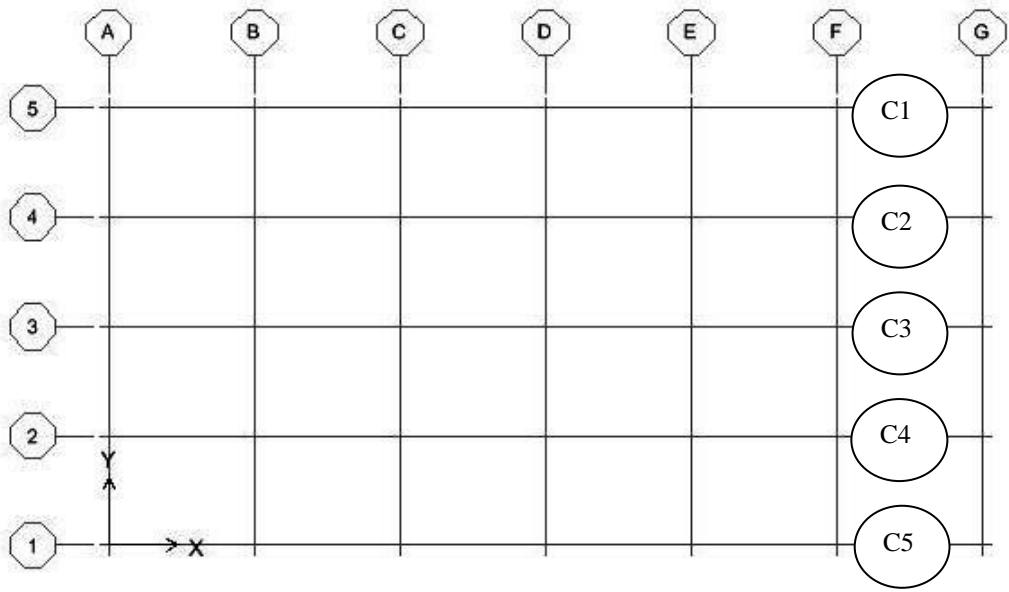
PLAN SHOWING LOCATION OF COLUMN FOR SHEAR FORCE AND BENDING MOMENT
